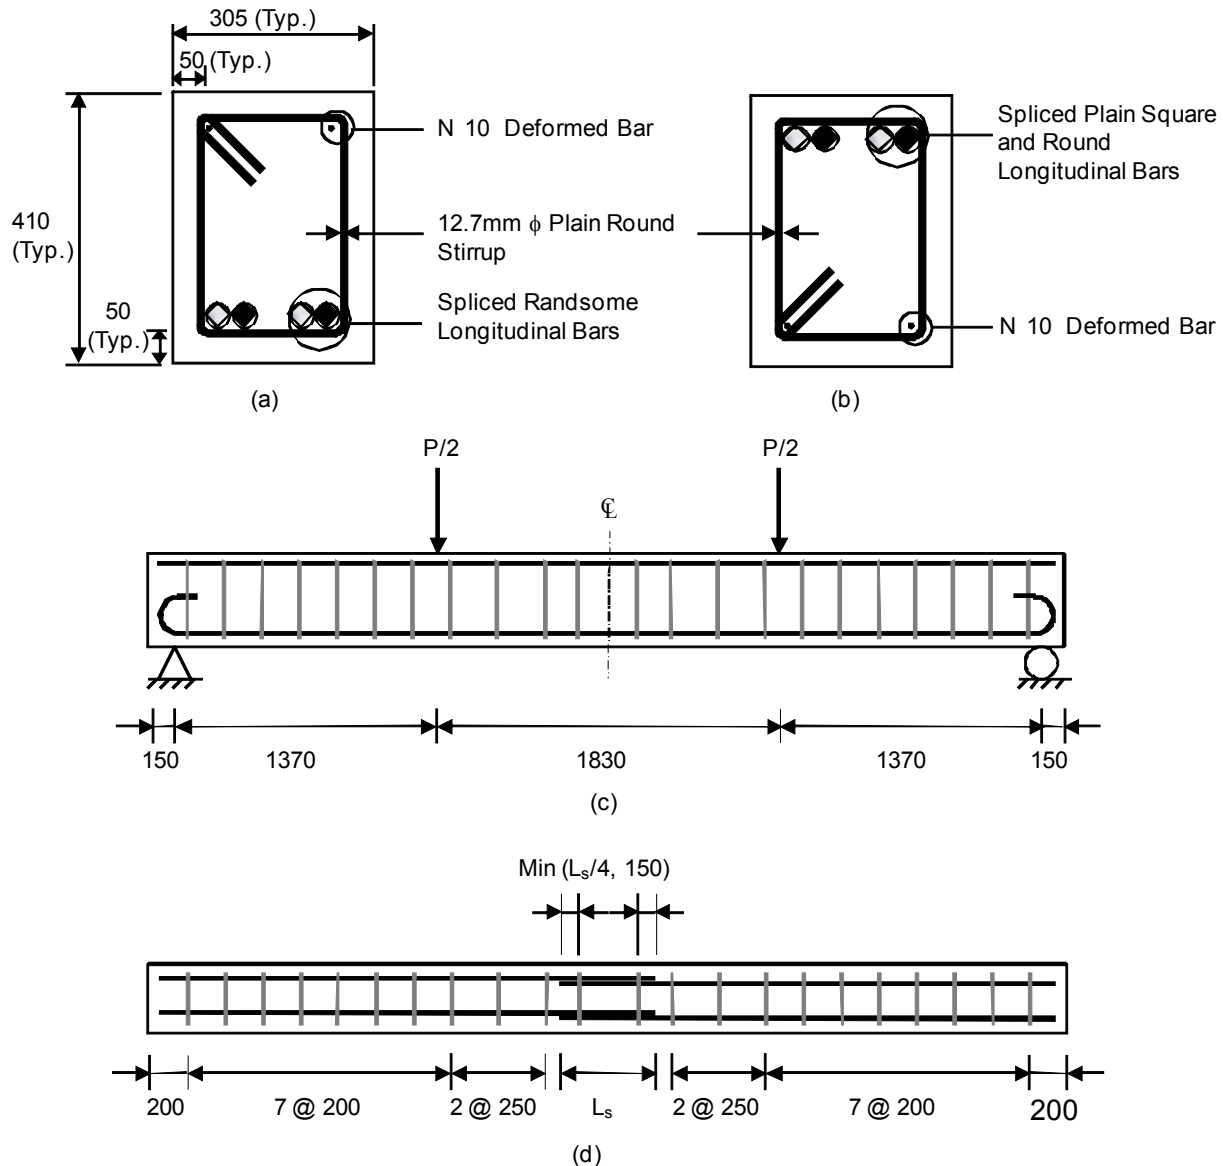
Splice Specimen Geometry: (a) Cross-Section for Specimens with Bottom Cast Reinforcement, (b) Cross-Section for Specimens with Top Cast Reinforcement, (c) Elevation, and (d) Plan View.
